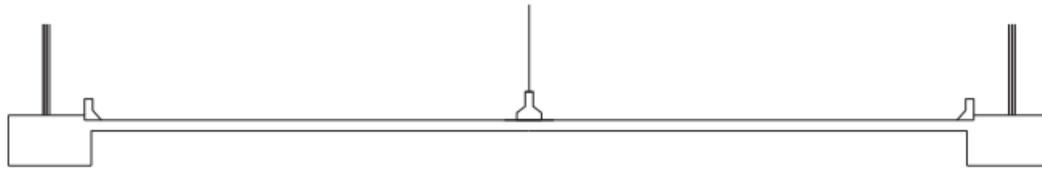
Twin beam concrete deck (Weiwei Lin, 2017)
